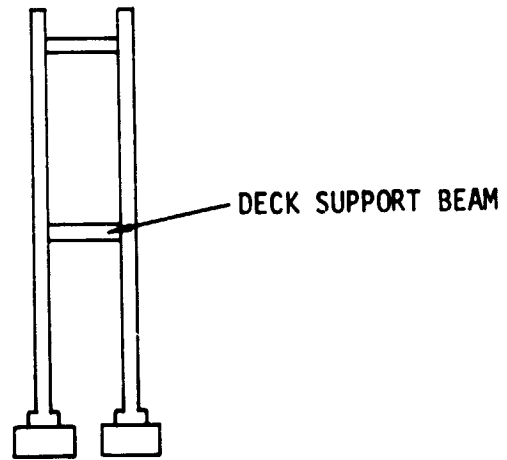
TOWER CONFIGURATION- ELEVATION VIEW
